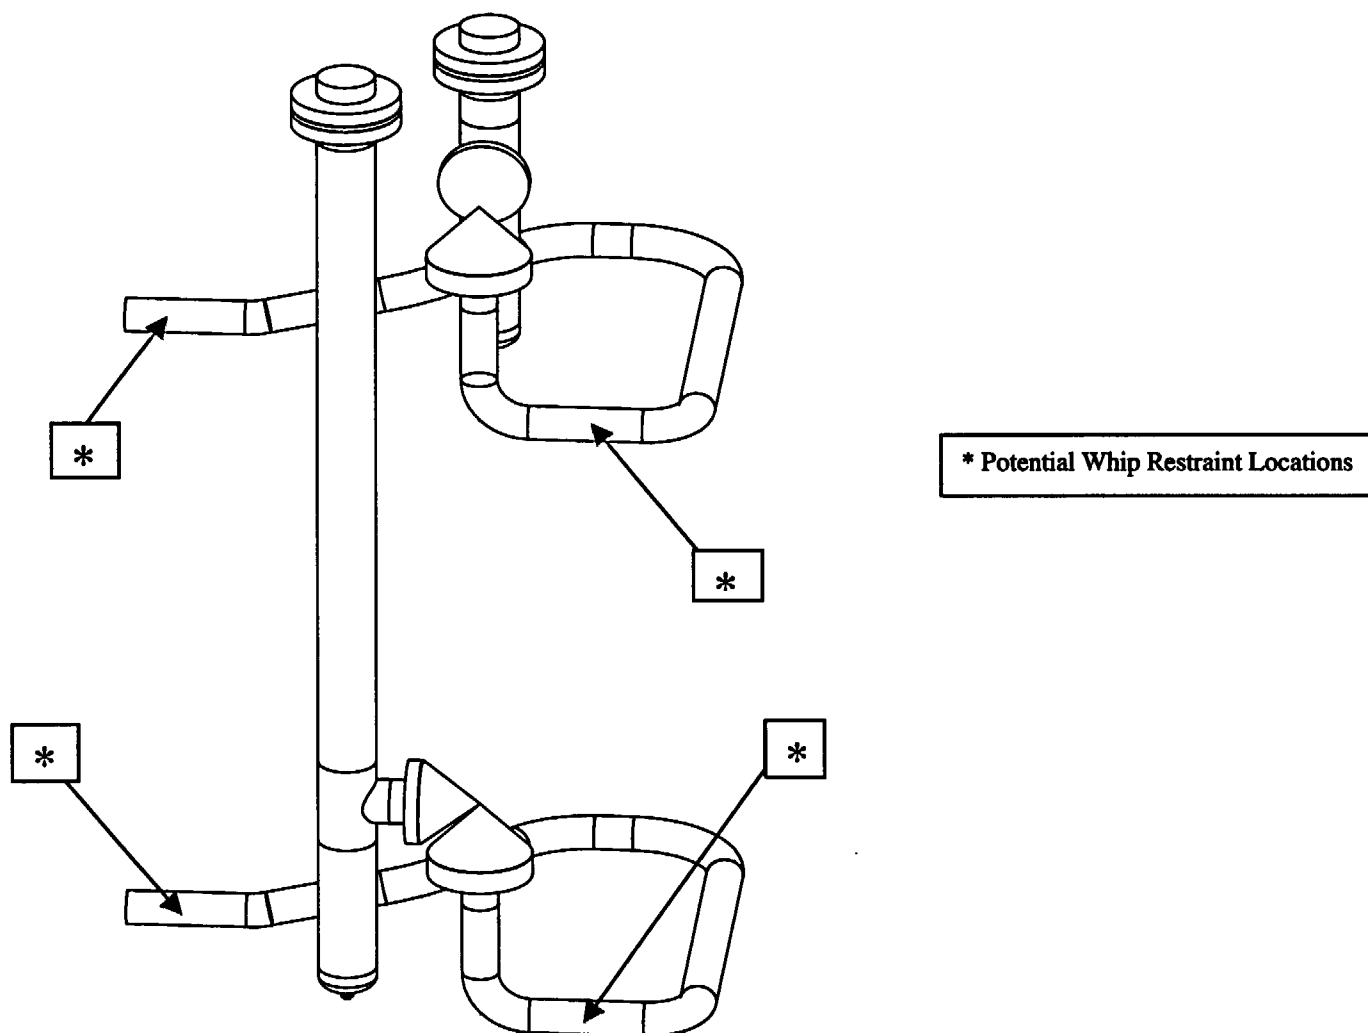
Pressurizer Safety Valve Inlet Pipe Break Protection (Sheet 1 of 2)
